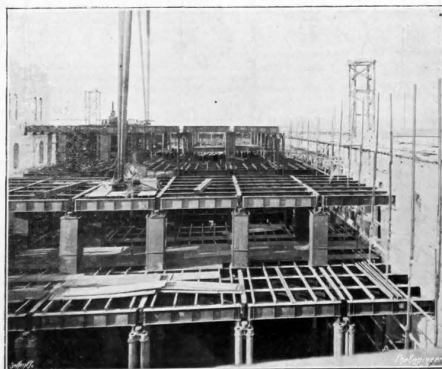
DEVOTO RESERVOIR—ALL THREE FLOORS BEING ERECTED
